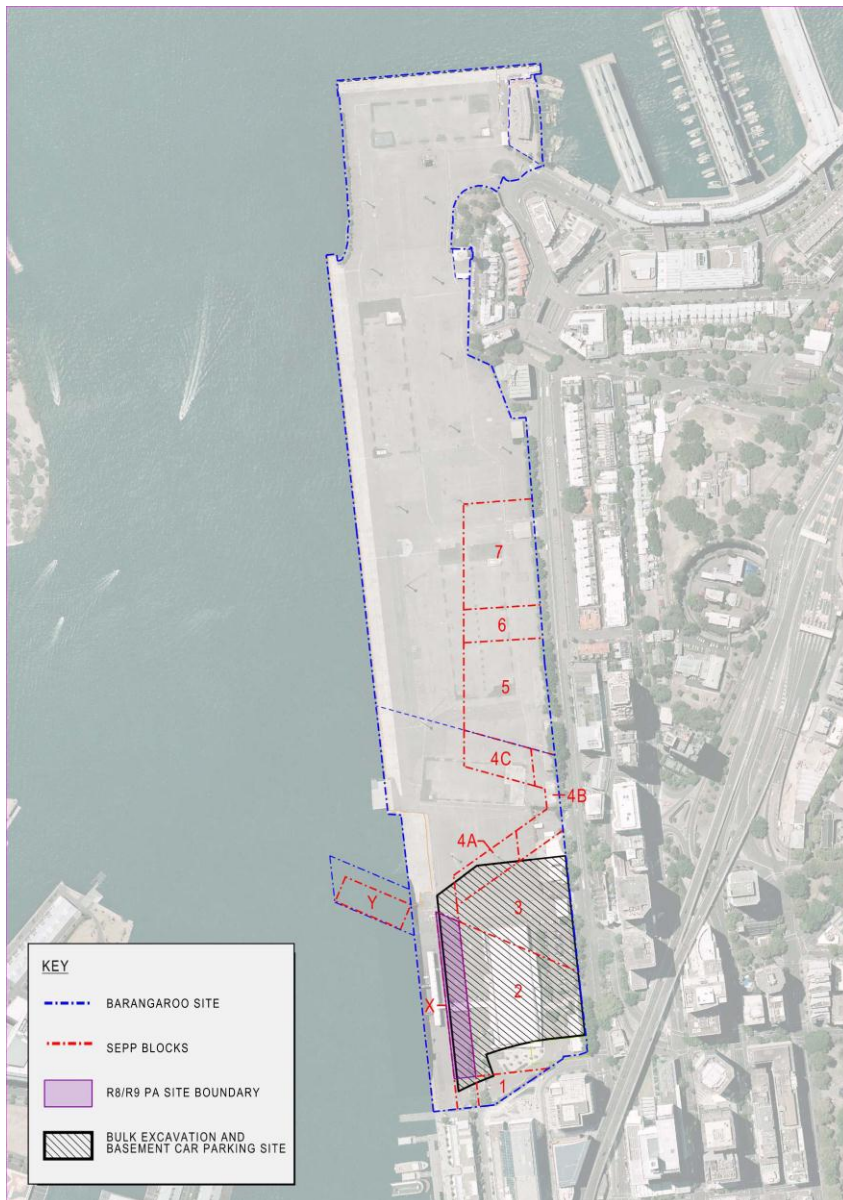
R8 and R9 Residential Building Project Application (MP11_0002) Aerial Site Location Plan
